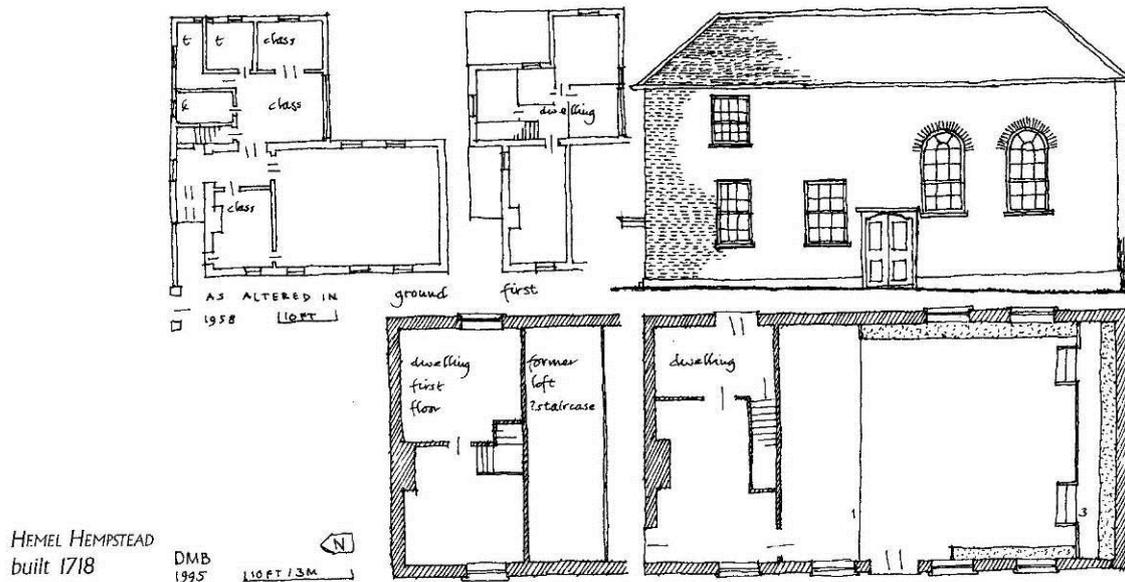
West elevation and plans in 1808 and 1958 (Butler)
